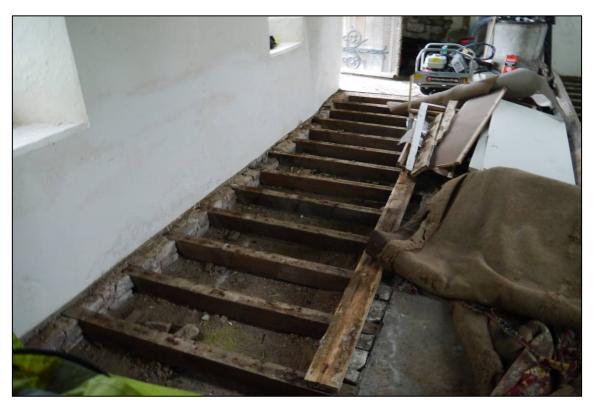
View of internal floor joists and brick sleeper walls (201), looking W.
